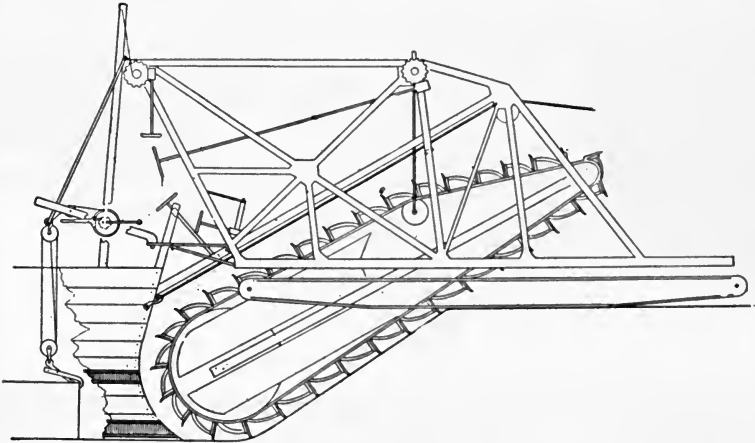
Diagram of excavating chain of Hovland tile ditcher. (Courtesy of St. Paul Machinery Co.)
